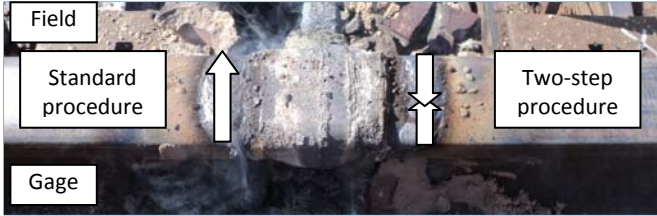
Two Weld Procedures showing Application of HAZ Overlay Next to Sheared Weld
